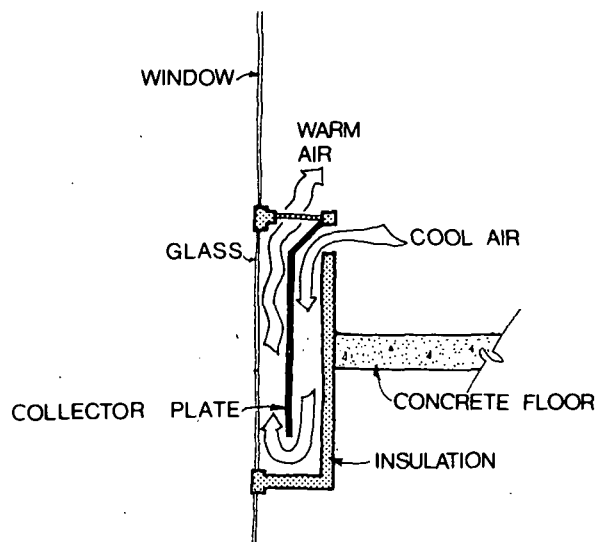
Odeillo Office Building: Thermosiphoning Wall Panel
